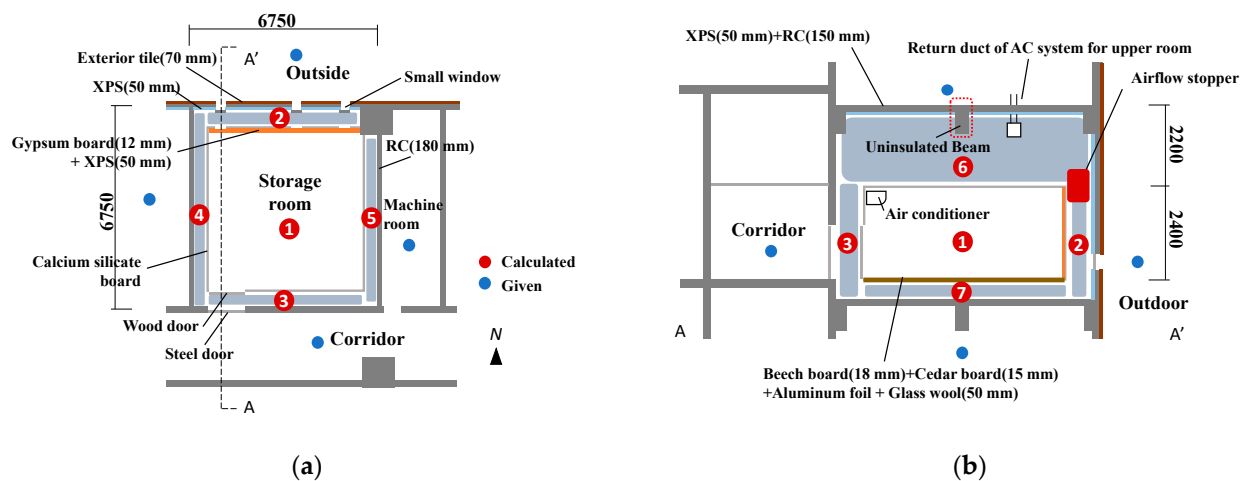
Outline of the storage room: (a) floor plan; (b) cross-sectional view A–A’.
